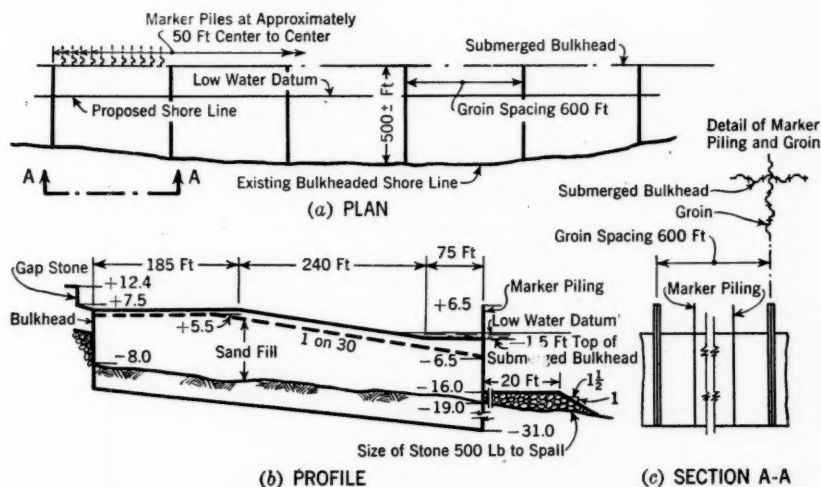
SUBMERGED OFFSHORE STEEL BULKHEAD AND STEEL GROINS FOR ARTIFICIAL FILL SECTION
